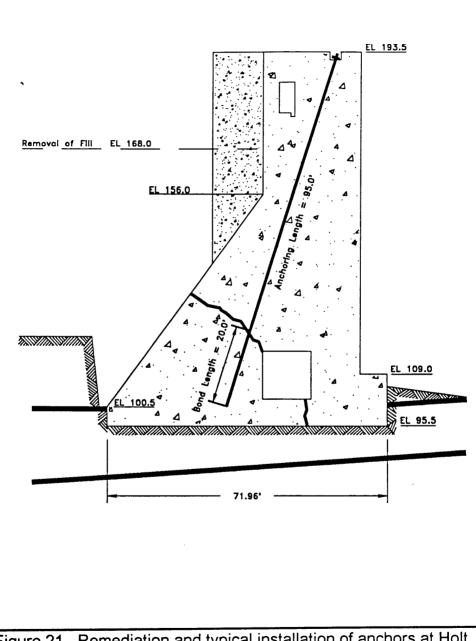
Remediation and typical installation of anchors at Holt Lock monolith 7L
